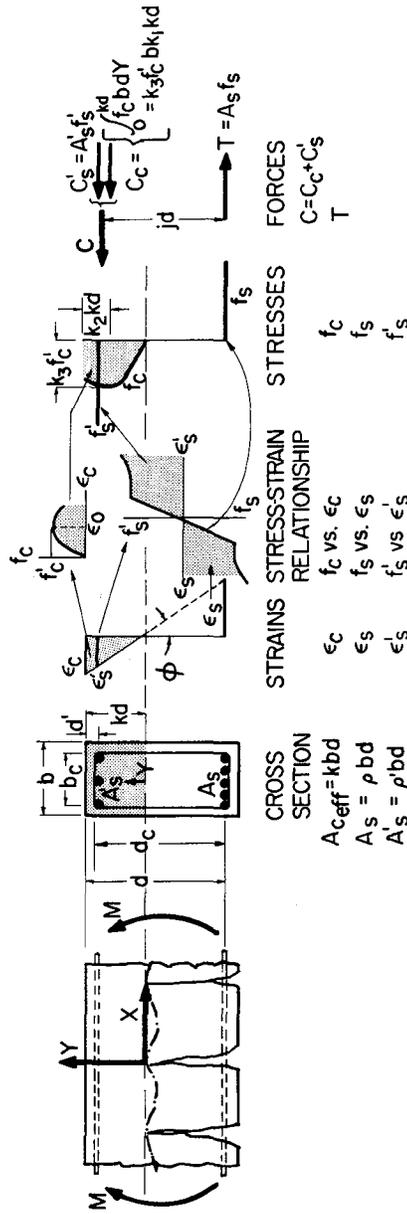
DOUBLY REINFORCED CONCRETE SECTION SUBJECTED TO PURE BENDING
